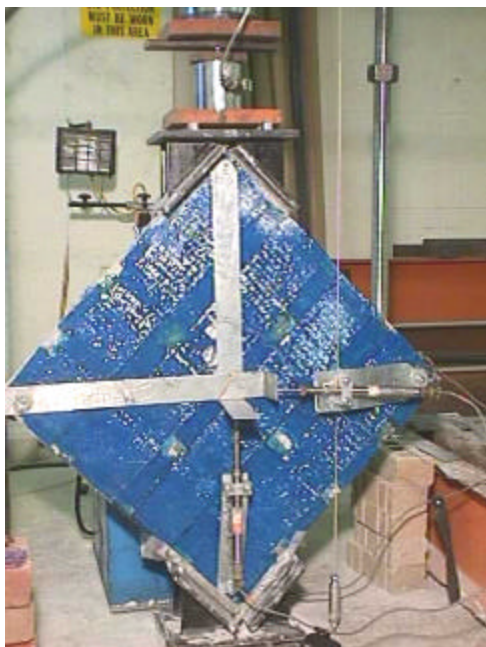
Wall 6 crossed strips configuration Fig. 4.27: Crack pattern of Wall 6
